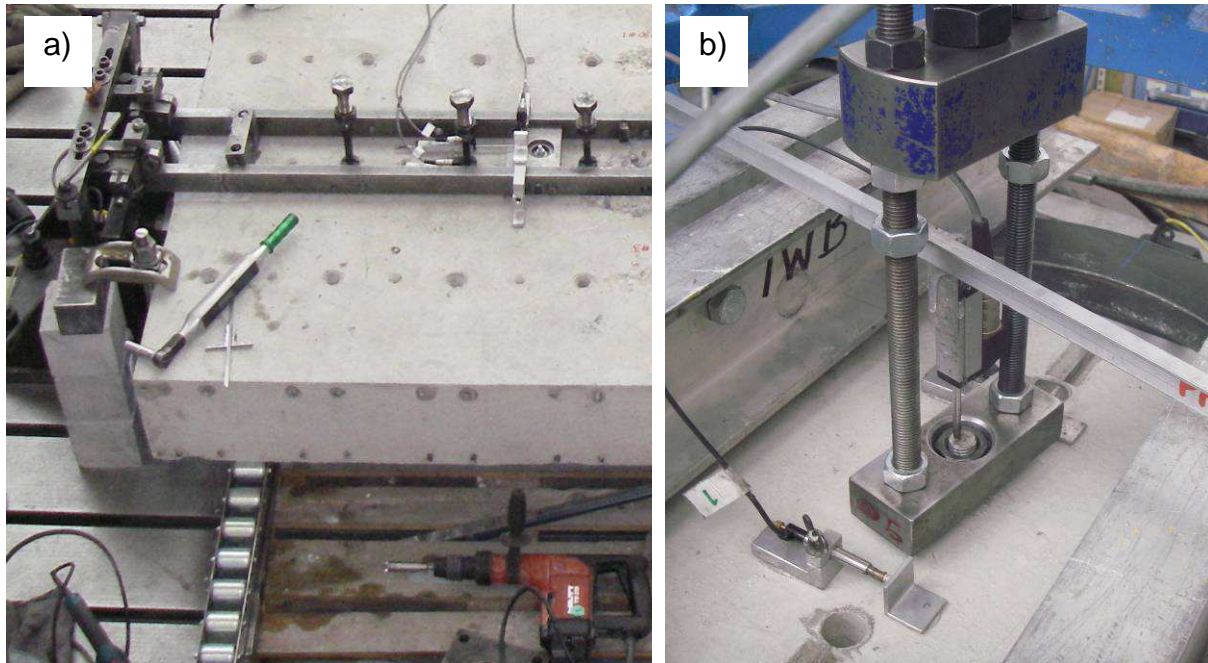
a) Bird's eye view on test setup mounted on rollers for shear cycling tests; b) Detail of crack width instrumentation for crack cycling test
